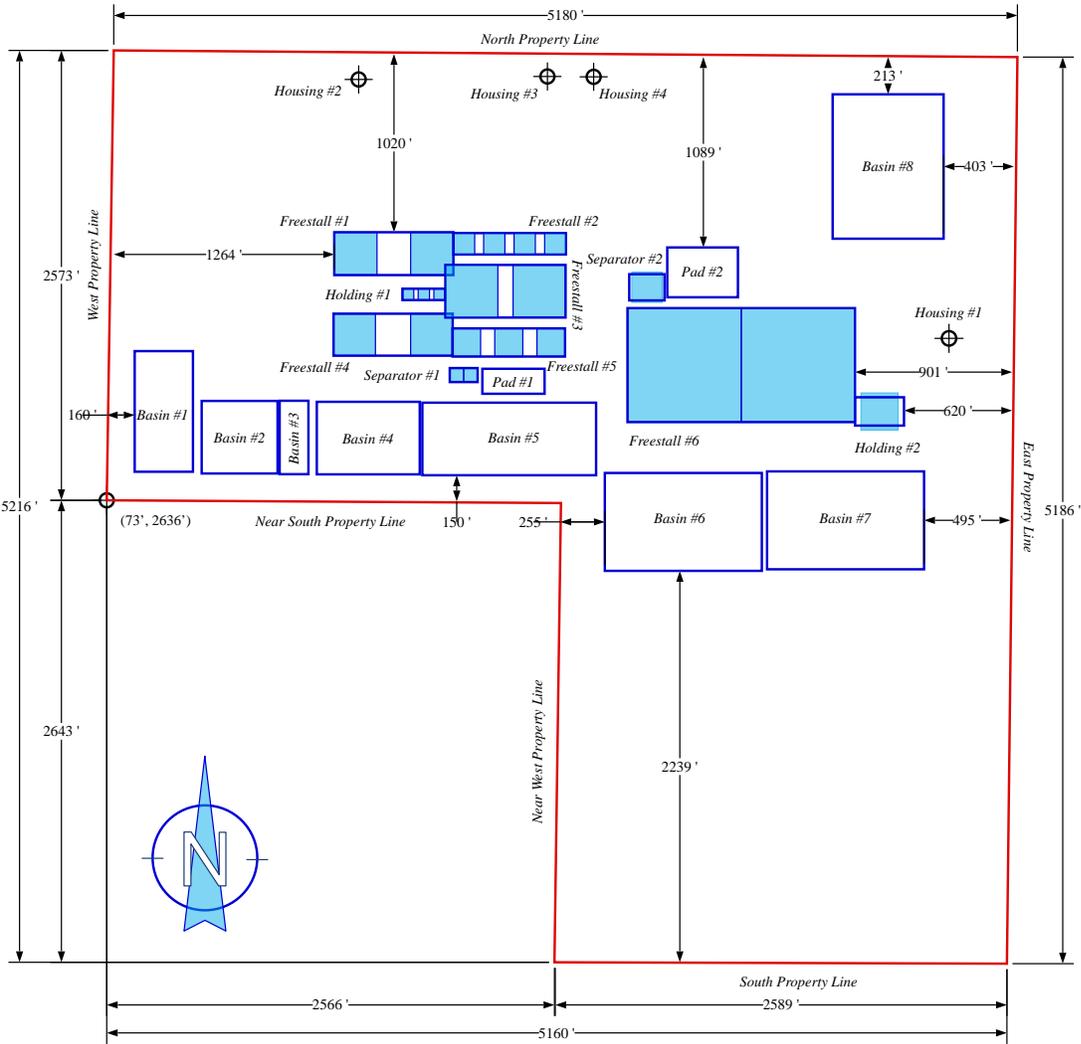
Modeled locations of the buildings, basins, bedding stacking pad, and property lines for the expanded West River Dairy
